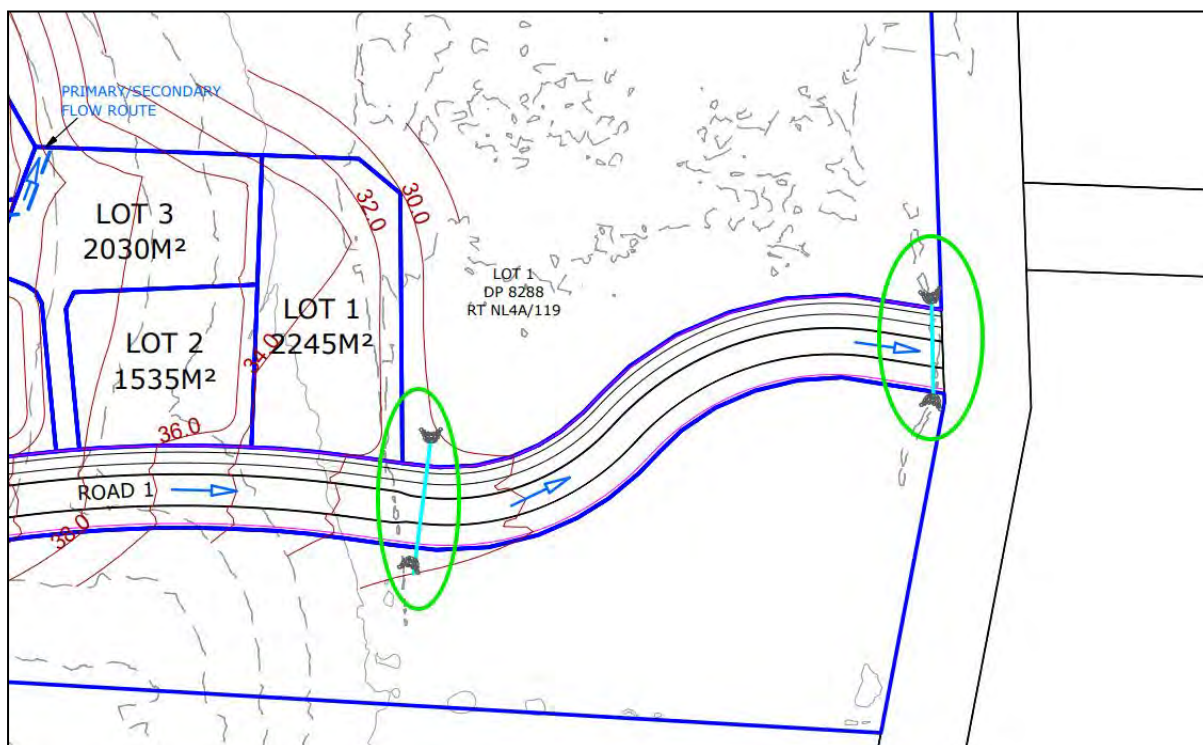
Markup of snip from 11460 Plan Set by Eliot Sinclair showing preliminary culvert modelling locations.
